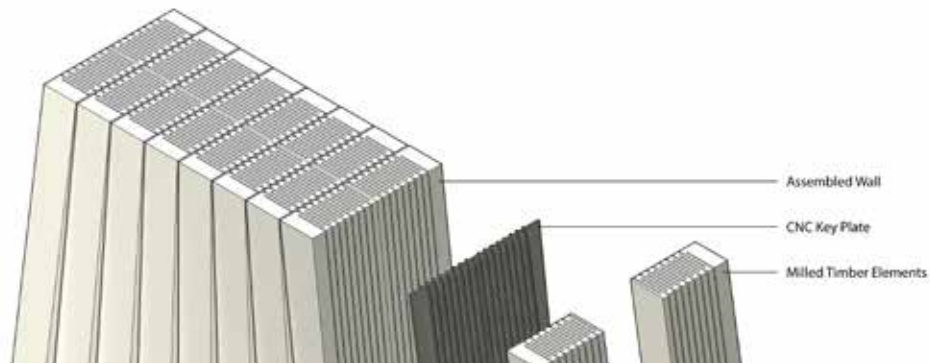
Isometric view of an assembly from multiple linear units generating a ruled surface geometry
